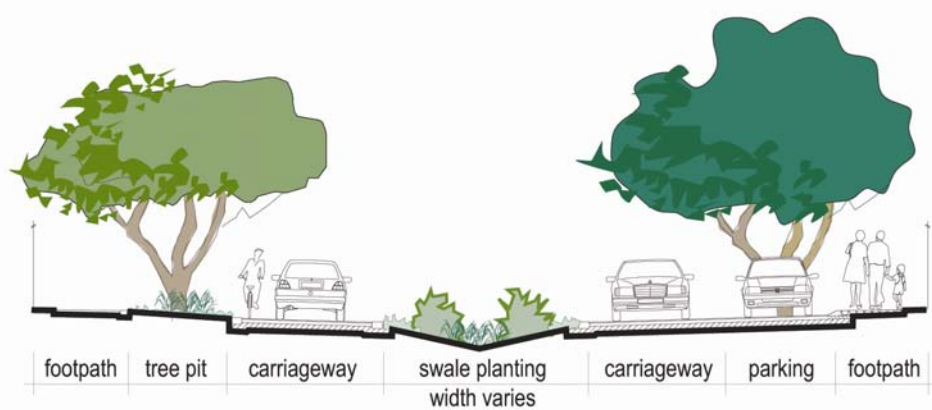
Streetscape section showing drainage swale and planting treatment
